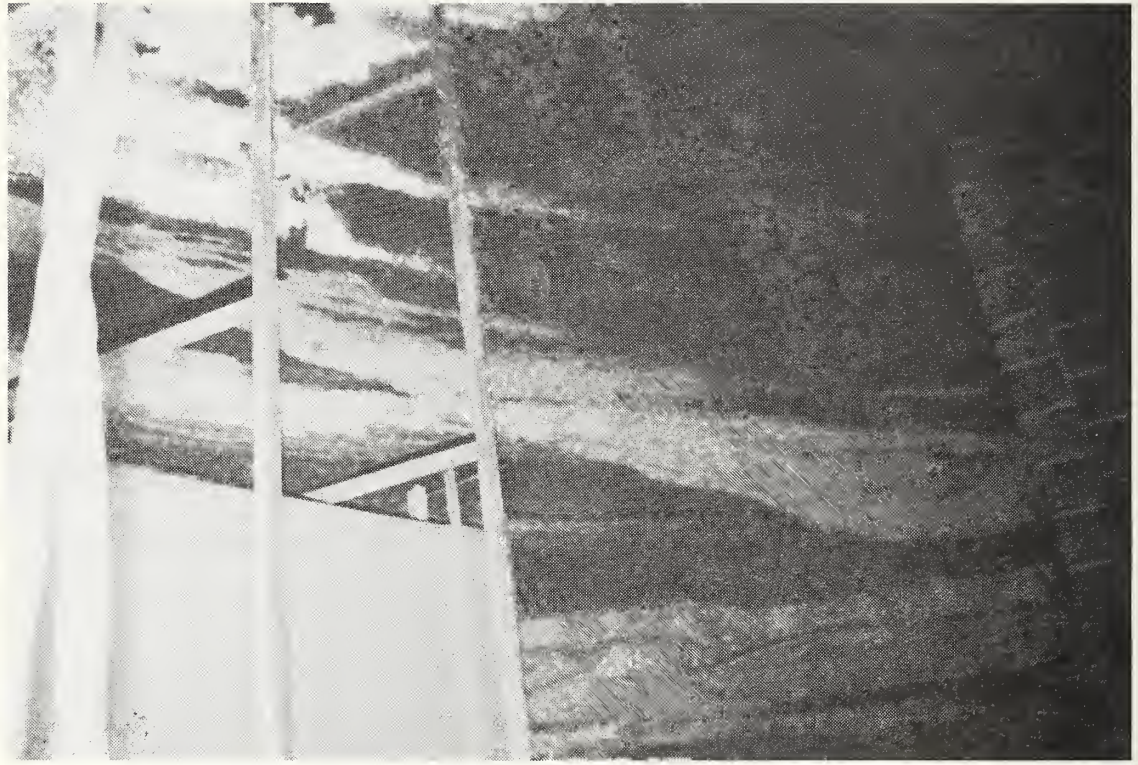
LEAKS THROUGH THE SHRINKAGE CRACKS BEHIND THE ARCHITECTURAL COVER (TILE WALLS)
